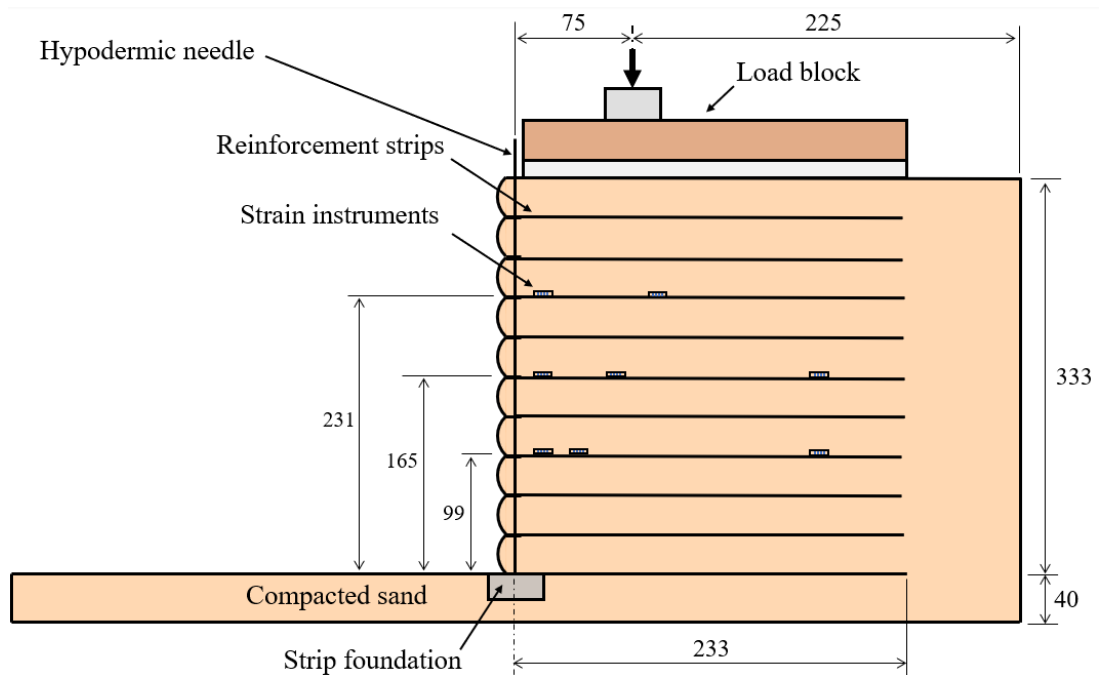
A cross-section of the stress-strain soil wall models. Not drawn-to-scale and all dimensions are in millimetres.
